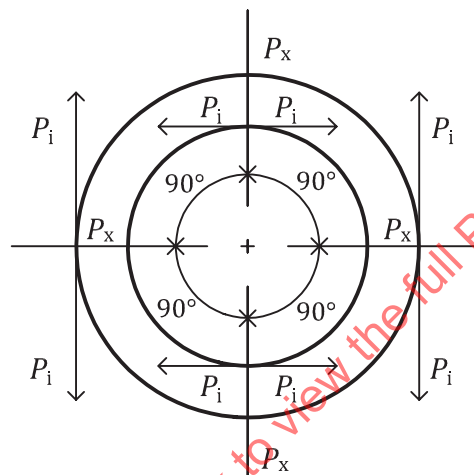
Circumferential prestressing steel arrangement for four pilasters
